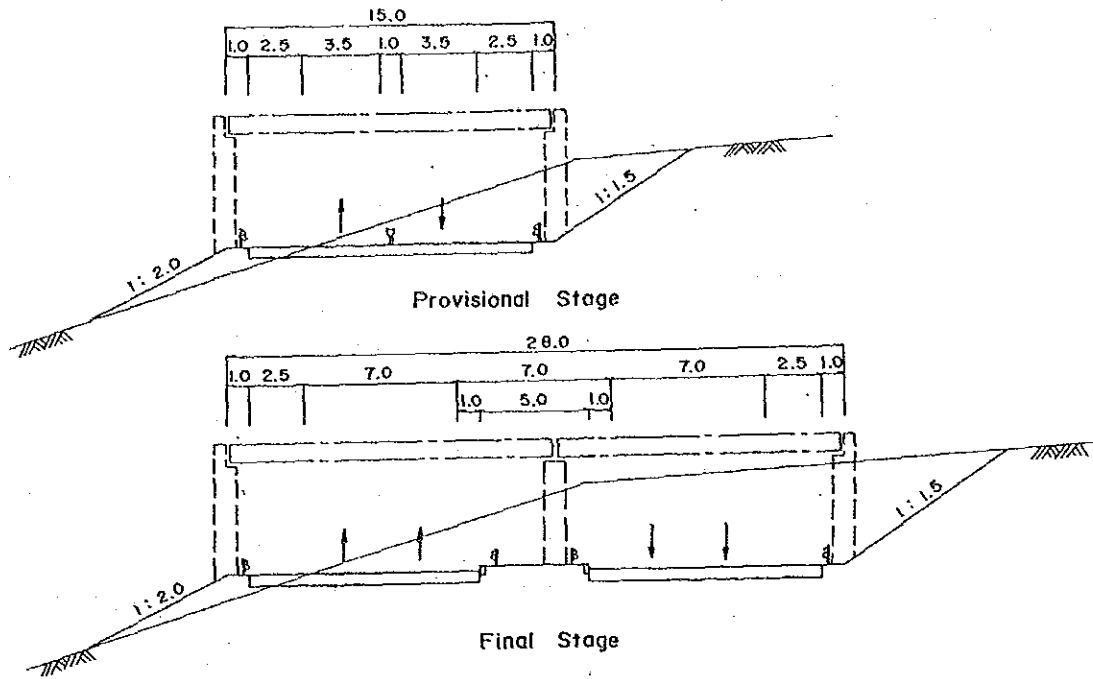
Typical Cross Sections on Staged Construction
